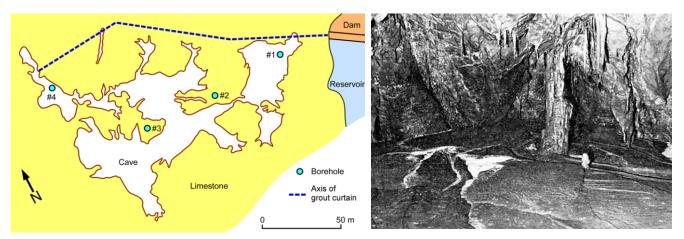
16 *Left*: Cave in the left abutment of Sklope Dam, Croatia discovered with an exploration gallery which was excavated after extensive grouting failed to achieve backpressure. *Right*: The grout mass on the cave floor. Modified from Božičević, 1971; photo courtesy of Srećko Božičević.
